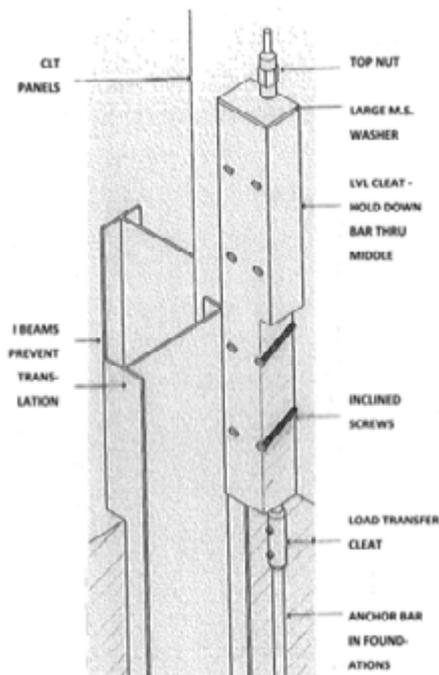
Diagrammatic isometric of a corner of the core to foundation connection showing pairs of steel members at corners to prevent core translation, and one of the vertical hold-down bar arrangements. (LVL Cleat cut-away for clarity)
